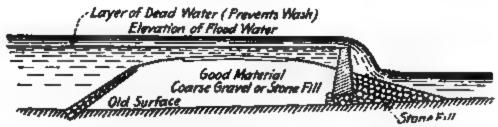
Method of Protection where Road cannot be raised above Flood Level
